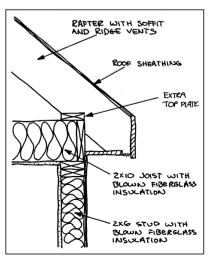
N.H. builder Al Topping uses an extra top plate to raise the rafters up above the ceiling joists. The result: full insulation at the eaves and good roof ventilation.
